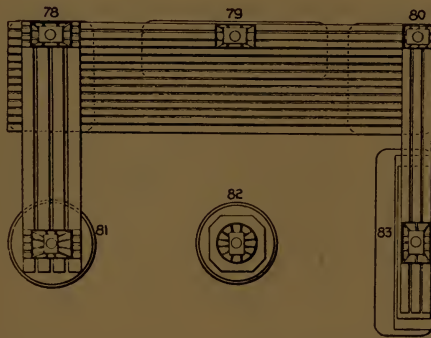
SKETCH PLAN OF EQUALIZING GIRDER SYSTEM FOR COLUMNS 78, 79 AND 80.
